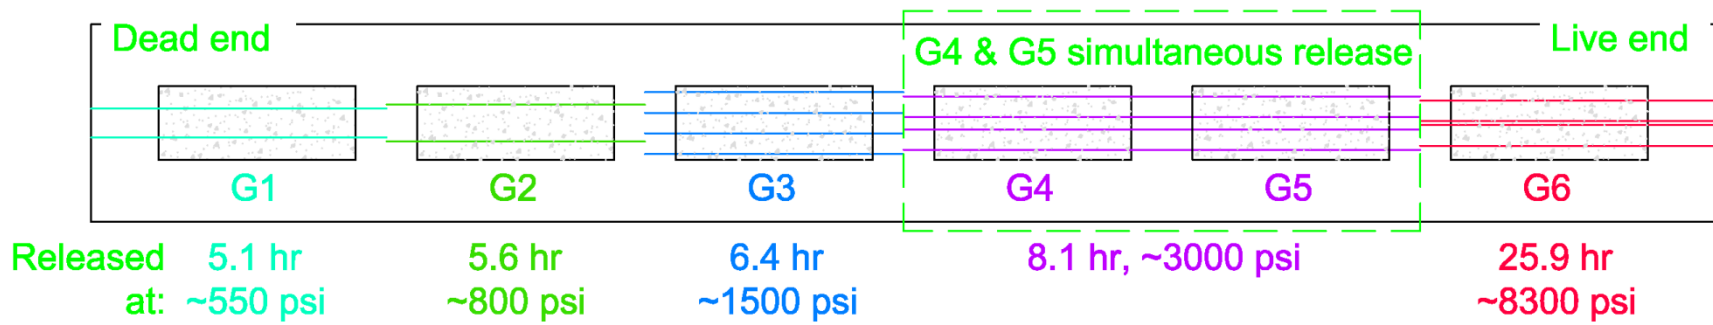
Short girder layout on prestressing bed, showing bonded strands, times of release, and approximate concrete compressive strengths at release
